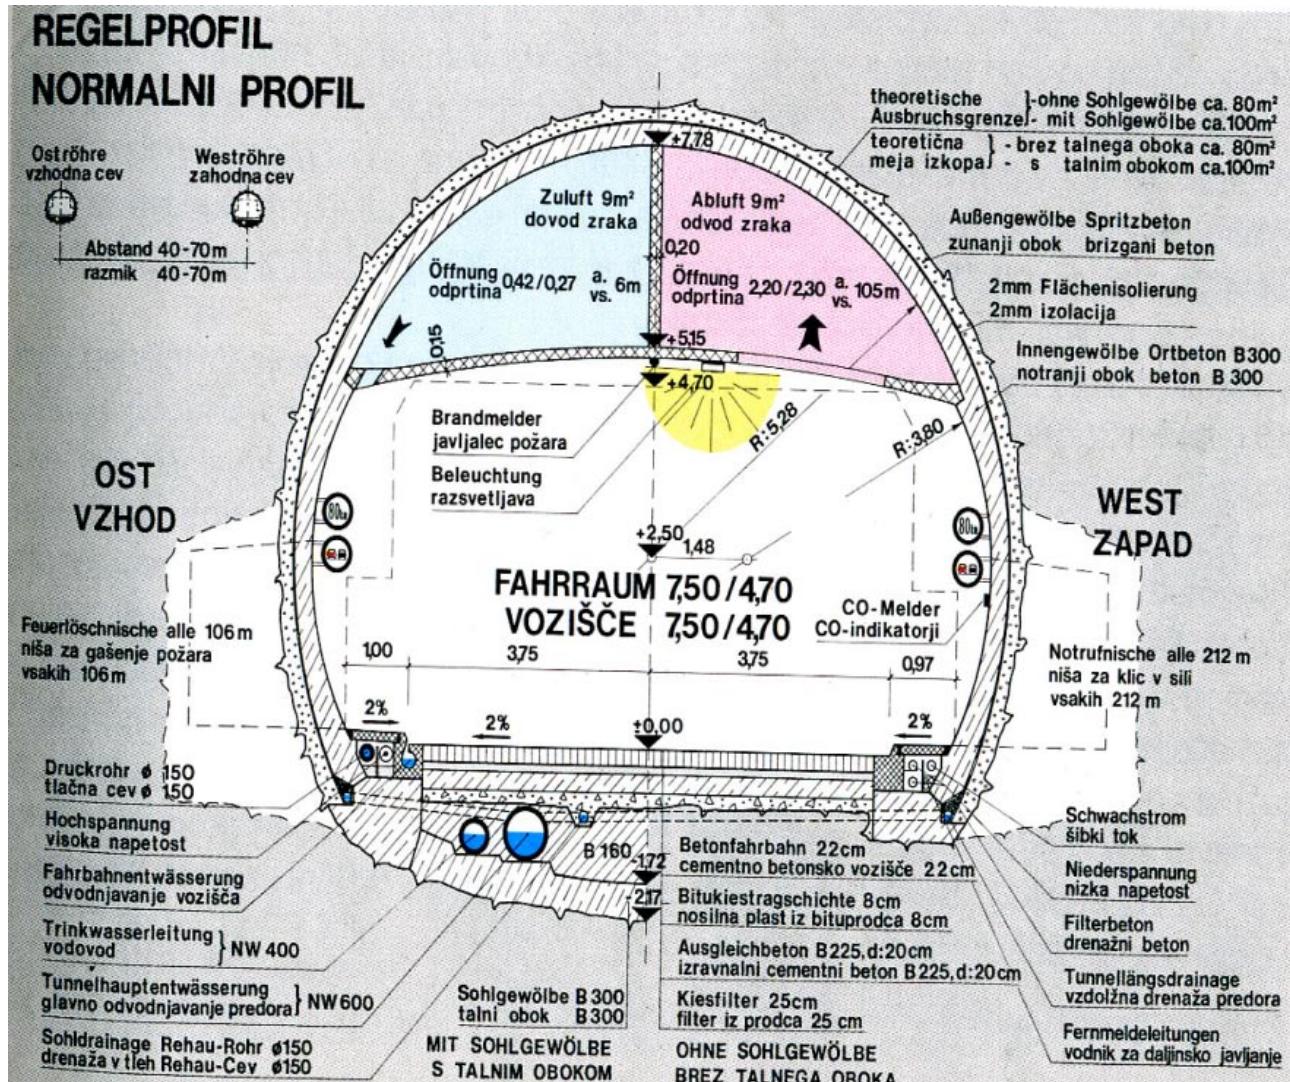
Cross section showing the two ducts for fresh air and exhaust air
